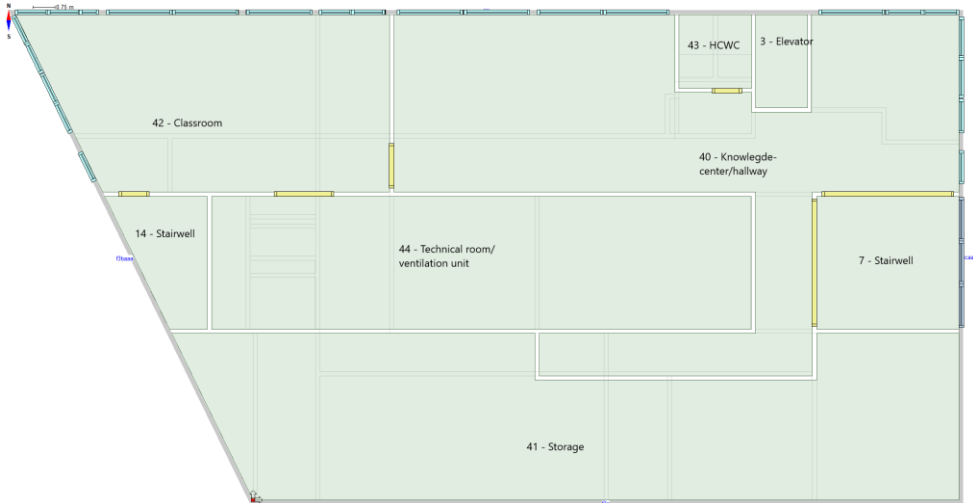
Floor plan of the 4th floor at ZEB lab, clipped for BEM in IDA ICE
